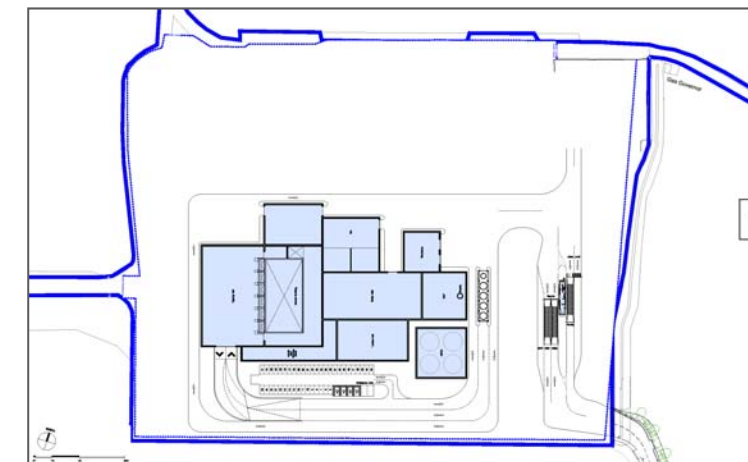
Initial site layout study - E/W alignment of ERF
